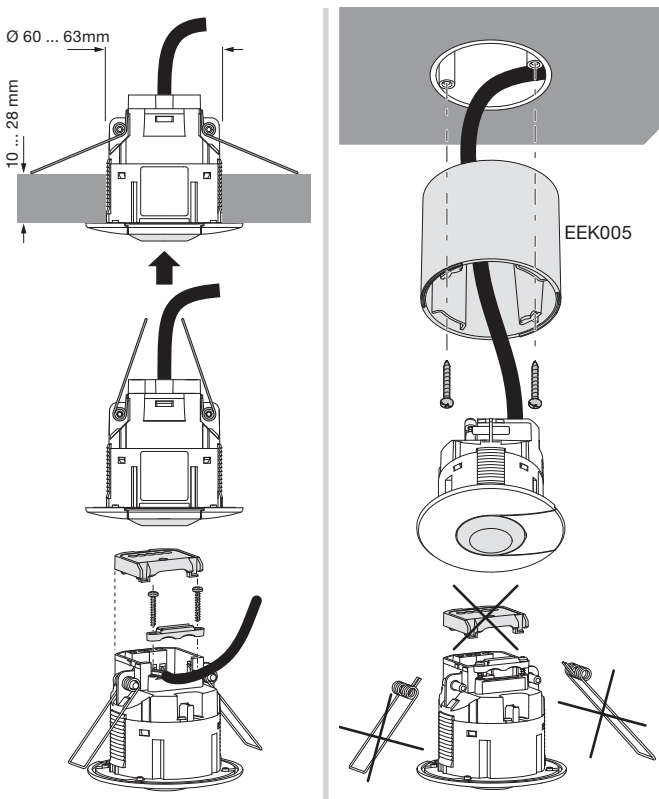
Installation in suspended ceiling or in wall-mounted housing EEK005
